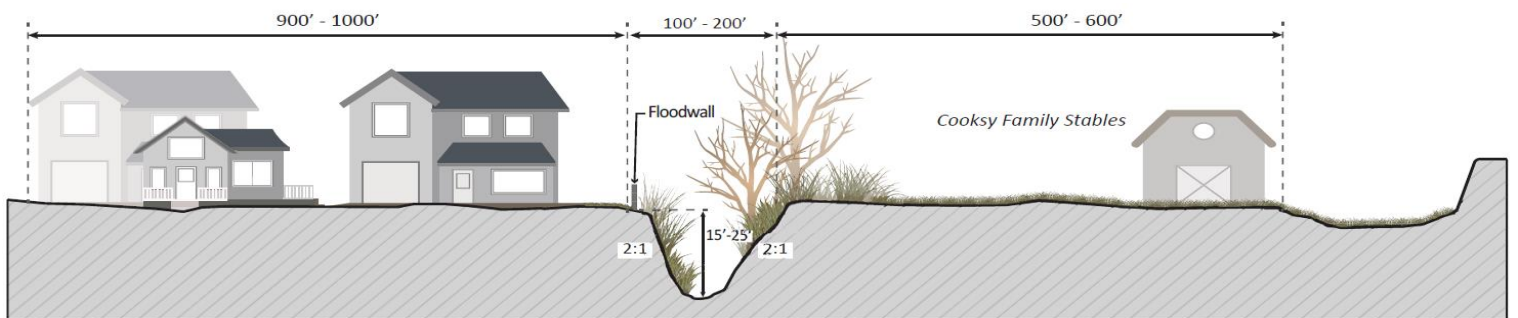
Typical Reach 8 cross-section (south half), looking downstream
